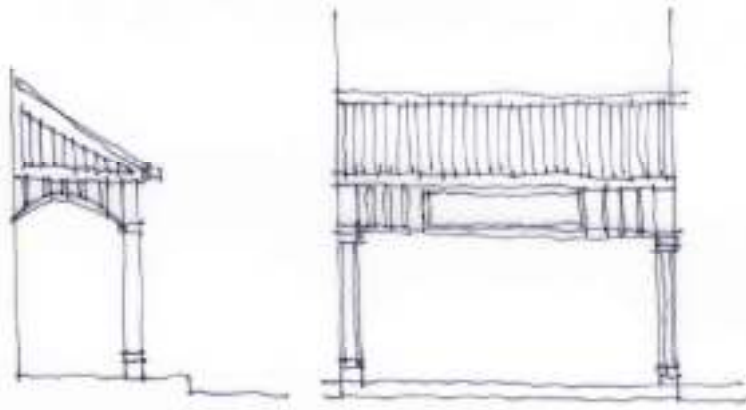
A traditional verandah provides shade, weather protection and a well-placed sign
